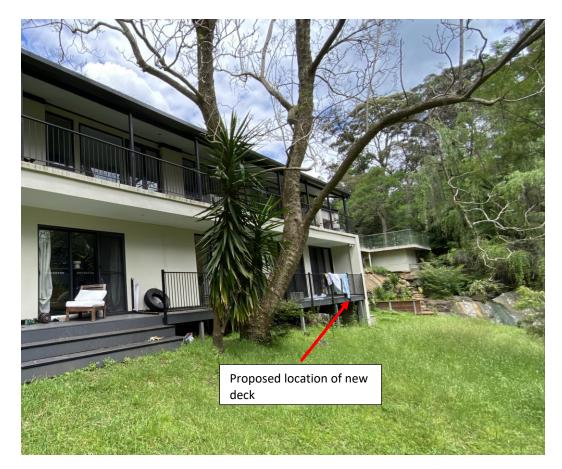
Proposed location of new portion of deck at rear lower ground floor level
